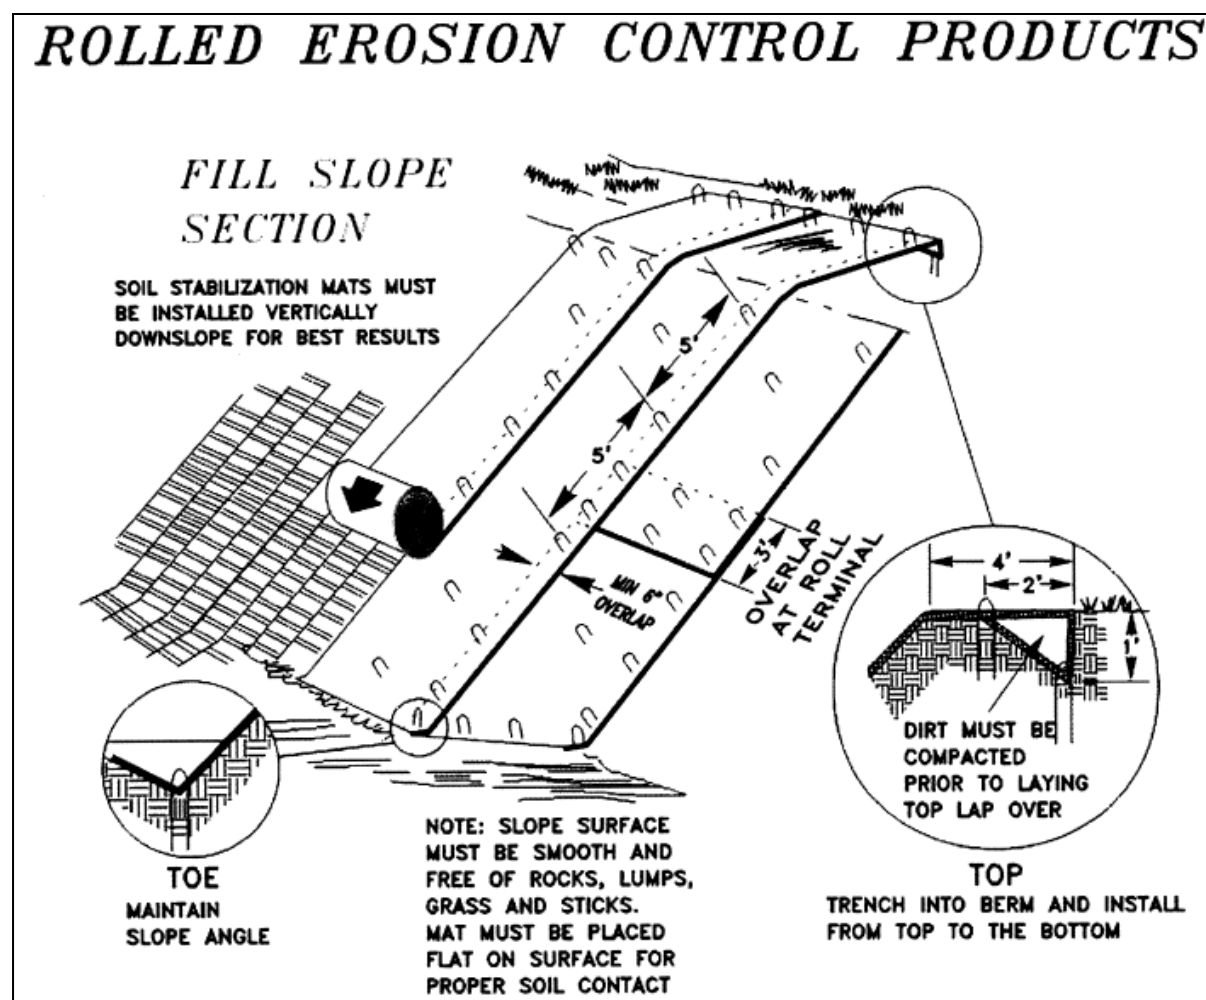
Example of methods recommended to install erosion control matting on sloping areas such as the dam wall embankment that require revegetation (Source: Department of Environmental Protection, West Virginia)
